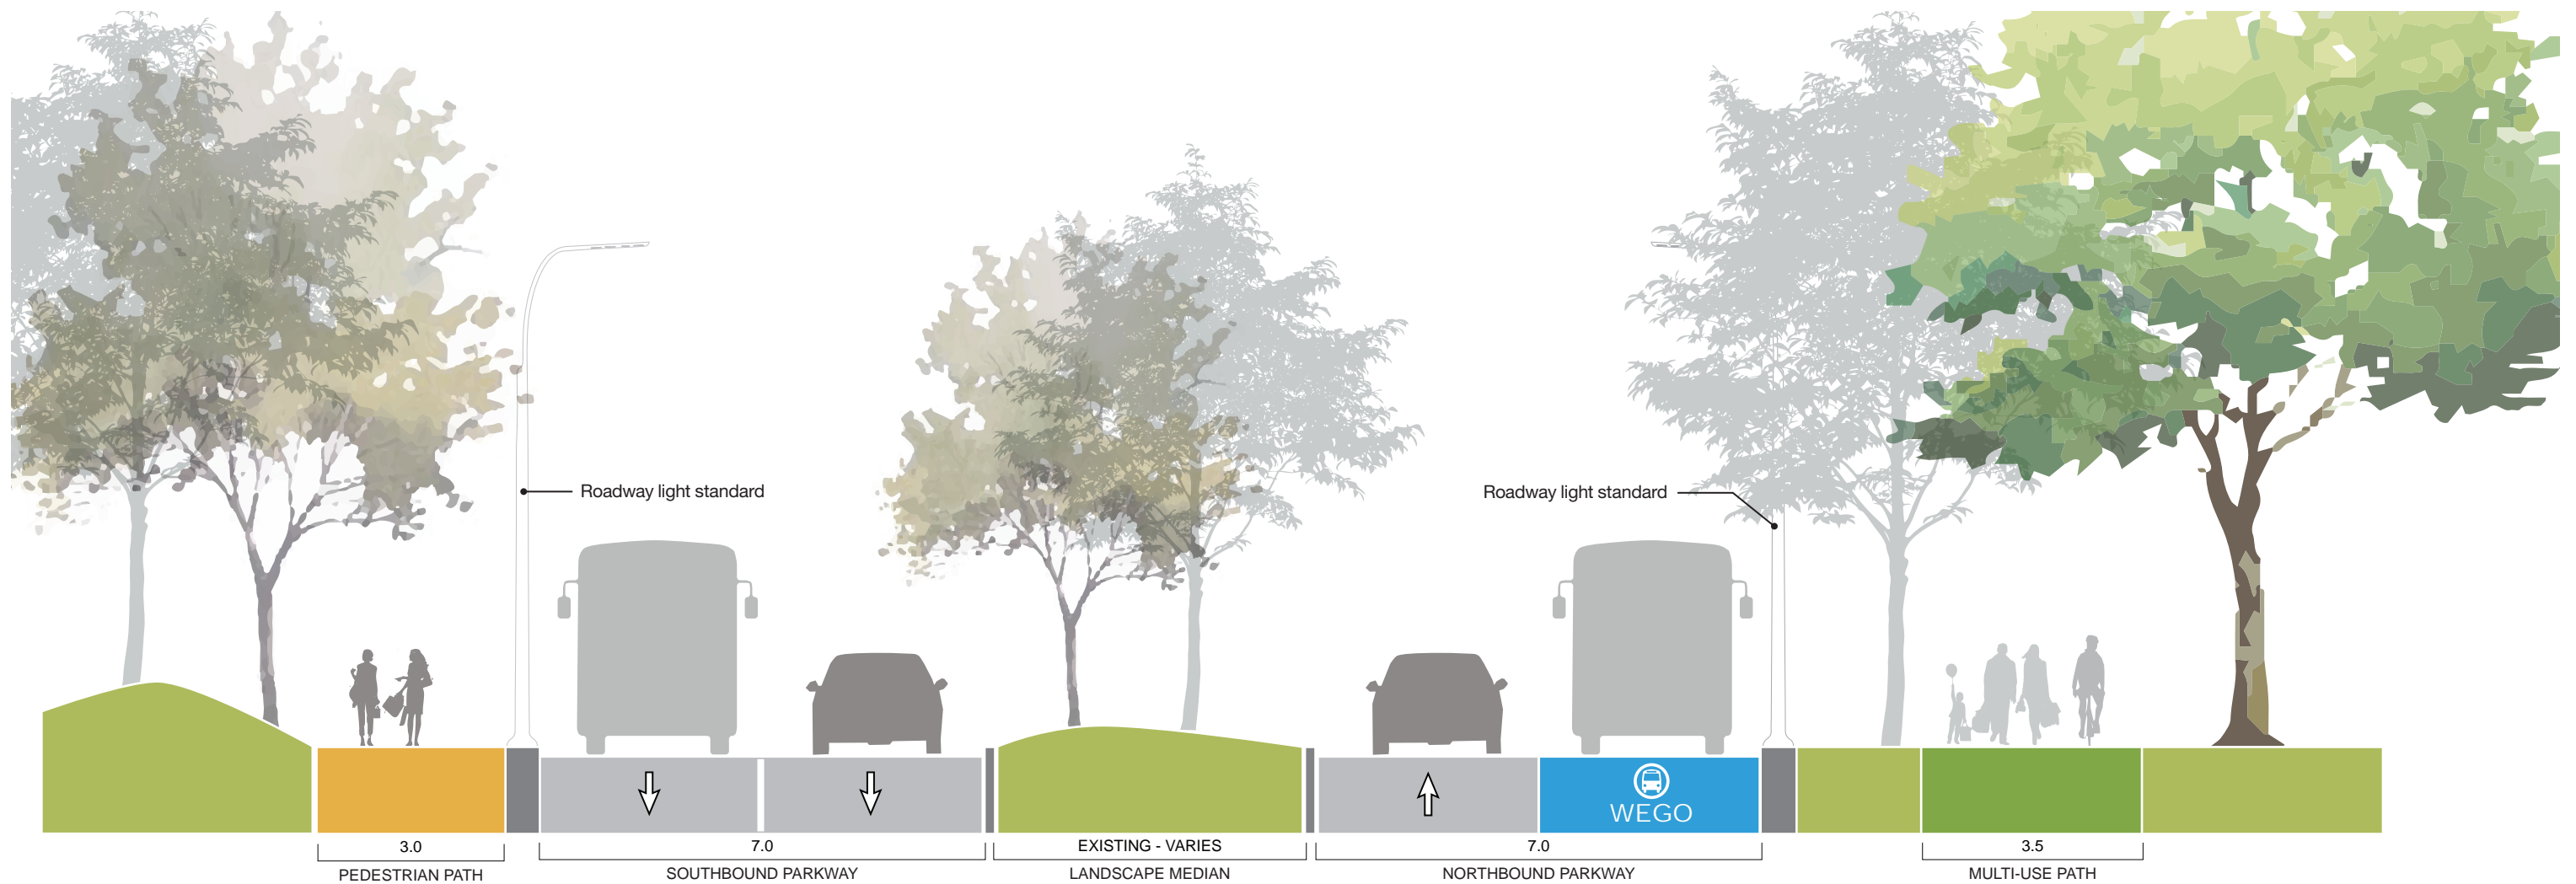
Parkway Section B1: North of TPGS - looking northward
